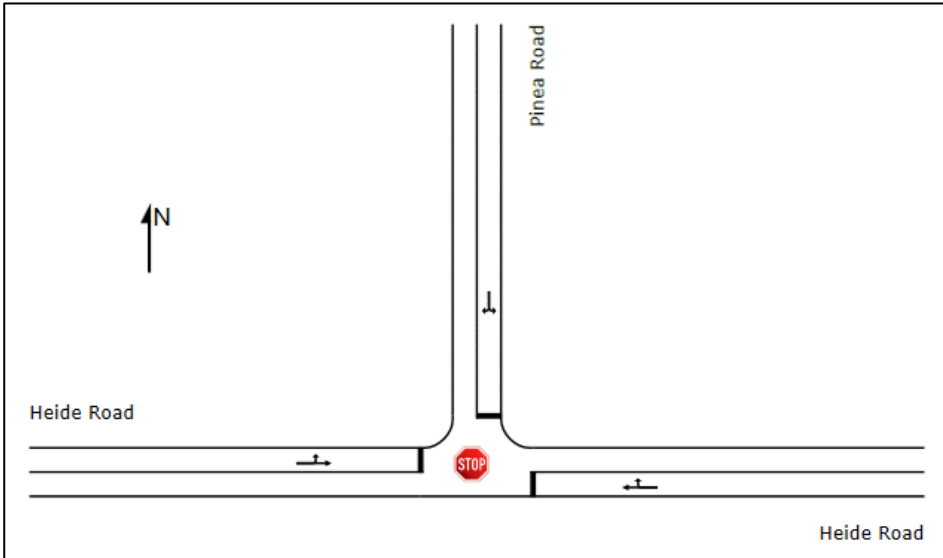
Existing Intersection Layout: Heide Road and Pinea Road
